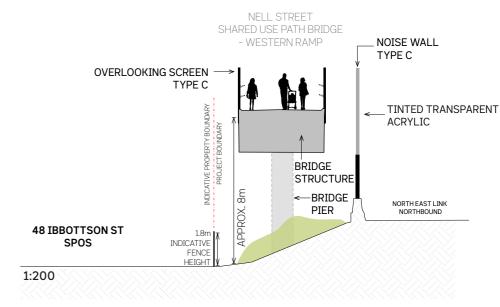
Detailed Analysis: Section C - Proposed architectural and structural elements adjacent to 48 Ibbottson Street
